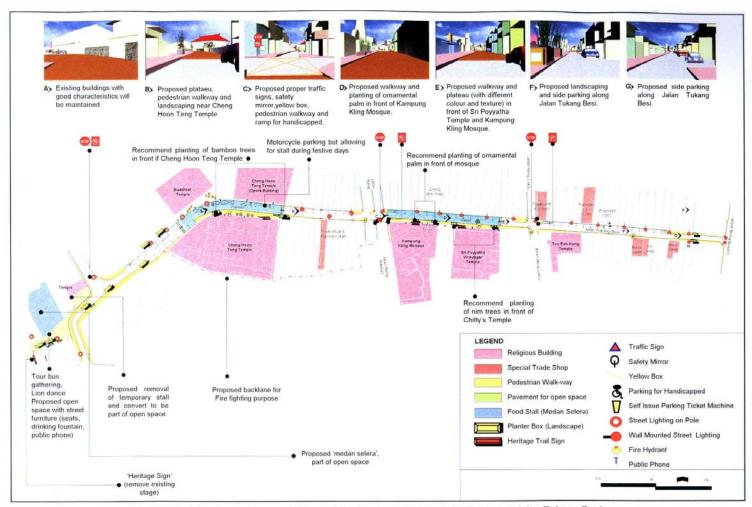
Proposed Improvements for Jalan Tokong, Jalan Tukang Emas and Jalan Tukang Besi
